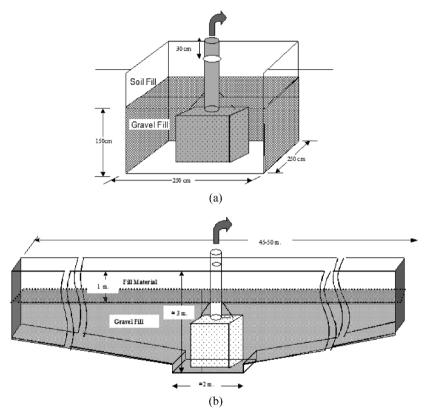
Typical details of (a) extraction well point and (b) drainage trenches (french drain)
